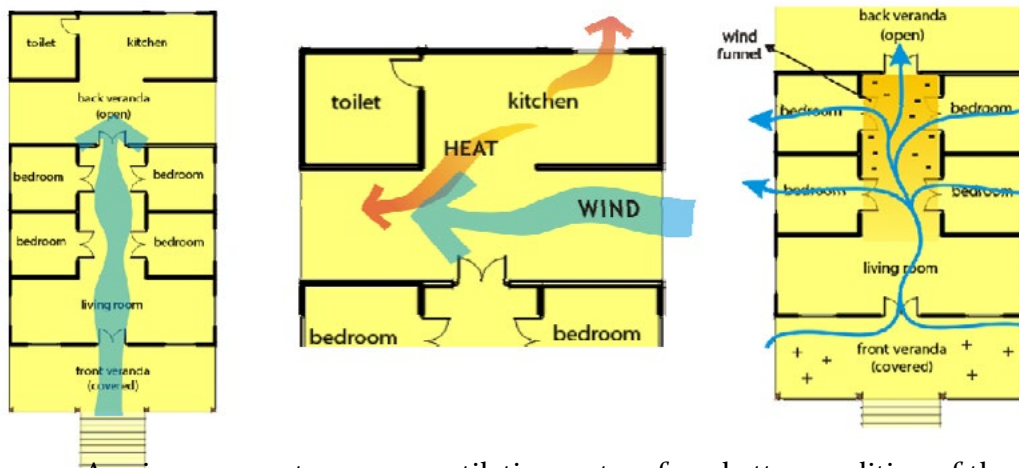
An air movement as cross ventilation system for a better condition of the traditional Malay house in West Kalimantan
